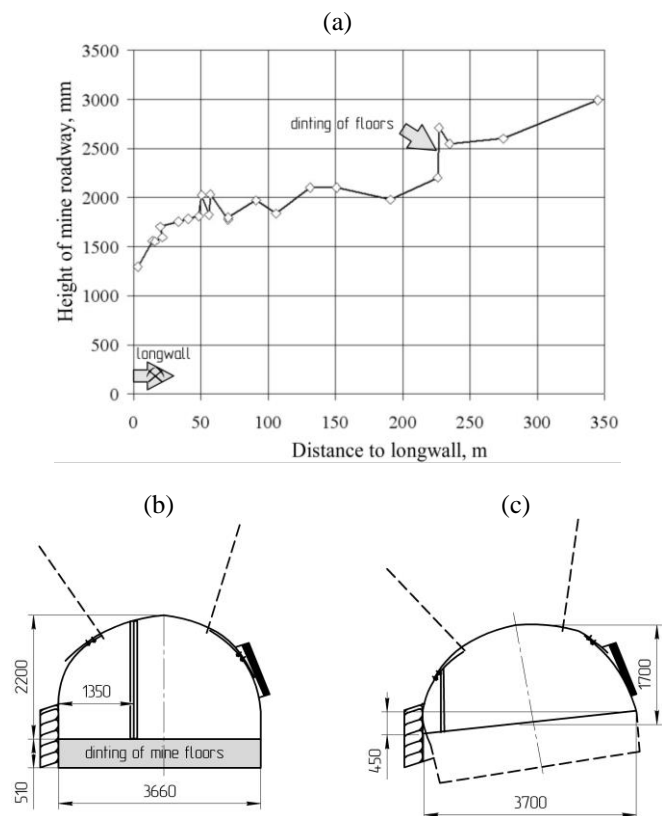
Conveyor passage height of the 12th western longwall face of c₁₈ seam before the longwall face (a) and sketches of the mine roadway state 229 m before the longwall face (b) and 20 m before the longwall face (c)
